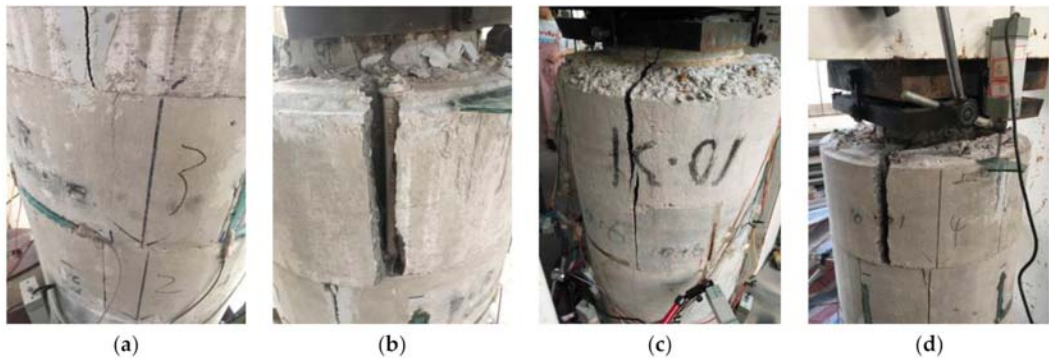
Failure diagram of self-stressed strengthened specimens. (a) Cracks on LCSS of specimen S1-S; (b) Fractures on LCSS of specimen S1-S; (c) Fractures on LCSS of specimen S1-SS; (d) Fractures on LCSS of specimen S2-S.
